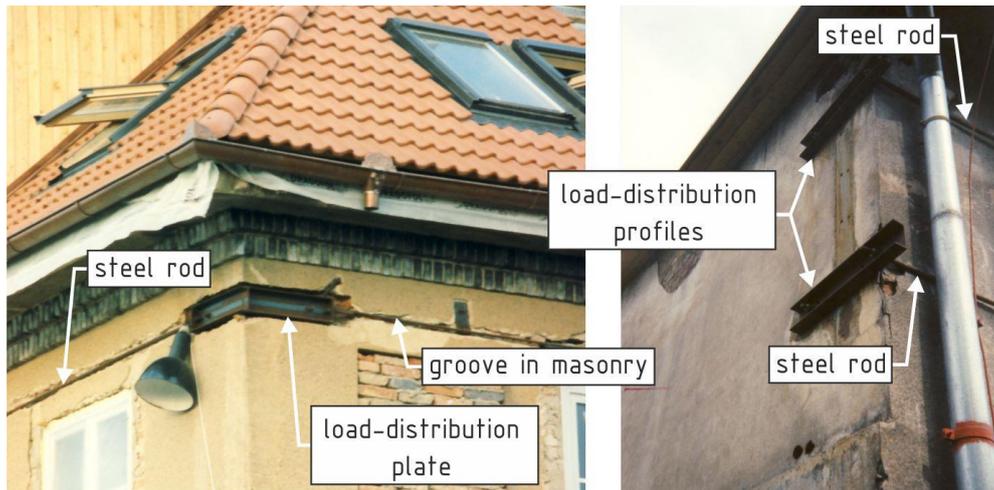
a) Bracing walls with circular steel sections, b) temporary bracing of masonry [10]
